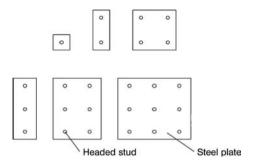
Possible arrangements of headed stud anchors [68]
